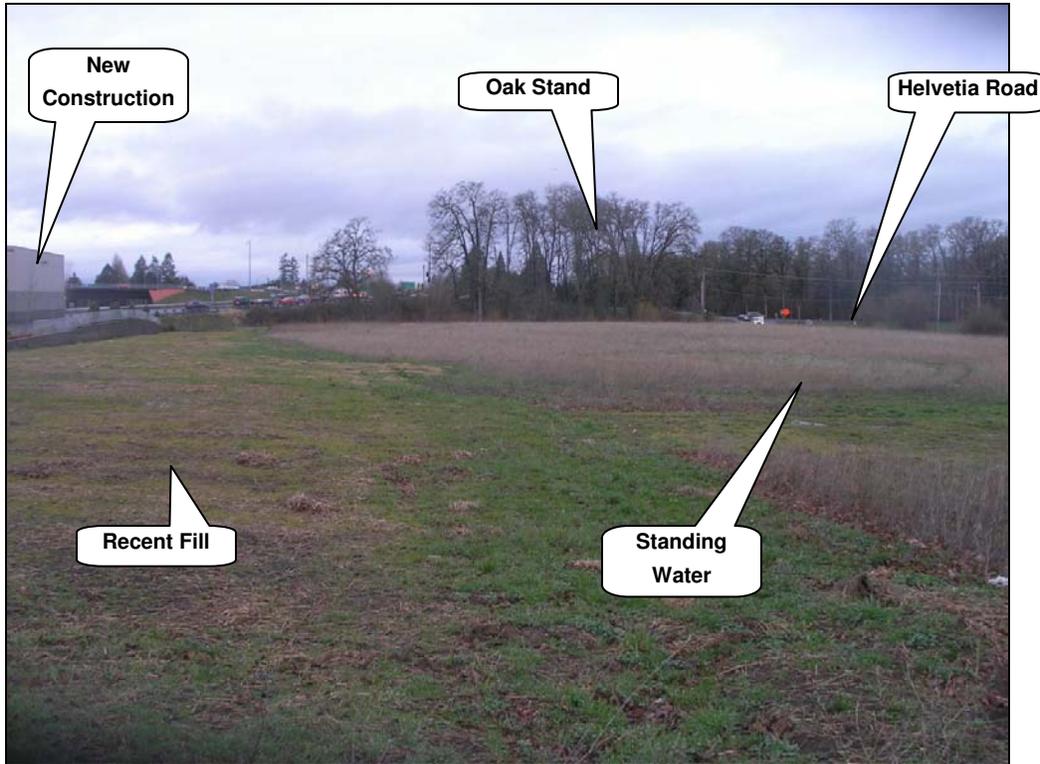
View of new construction and small oak stand north of US26 and east of Helvetia Road, facing west.
